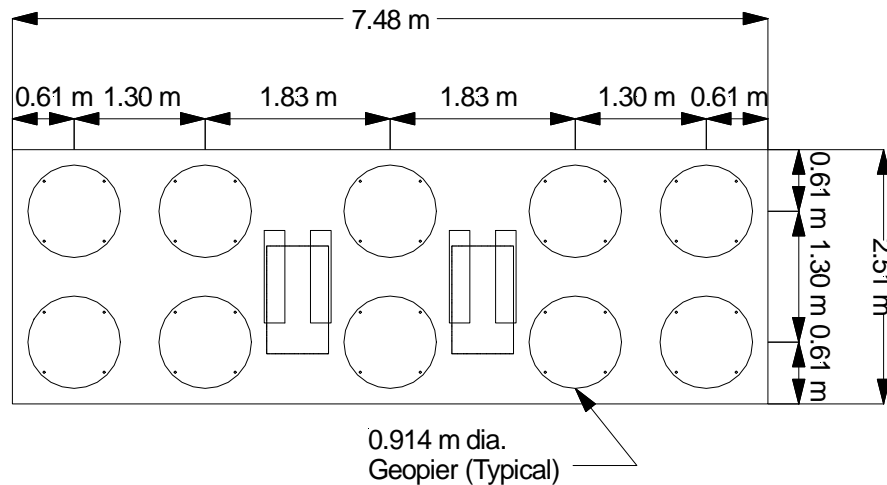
Plan view of a typical foundation and geopier system used to support the load frame used in the Bent #6S 2000 test
